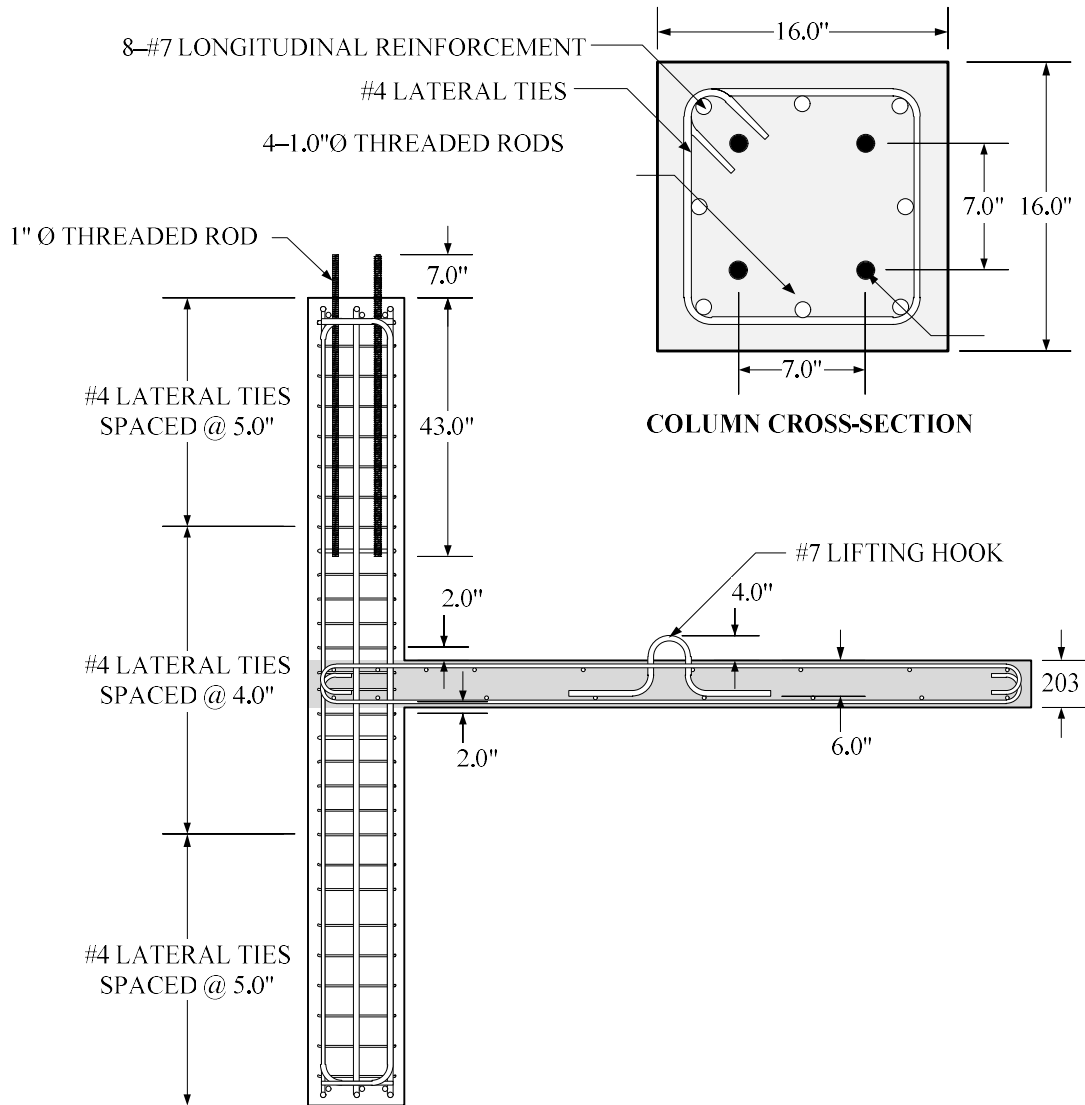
Typical Column Reinforcement Detail (Loading Direction)
